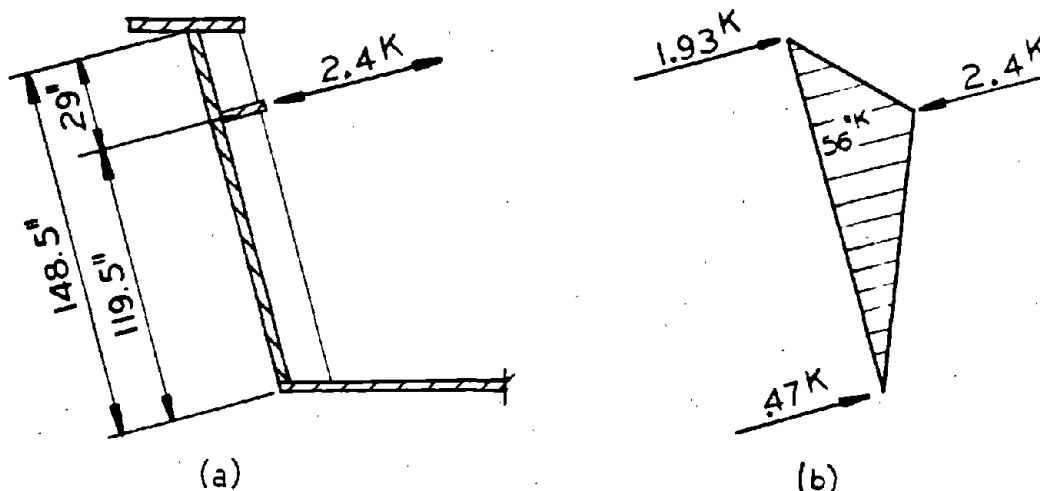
LATERAL FORCE ON TRANSVERSE STIFFENER
